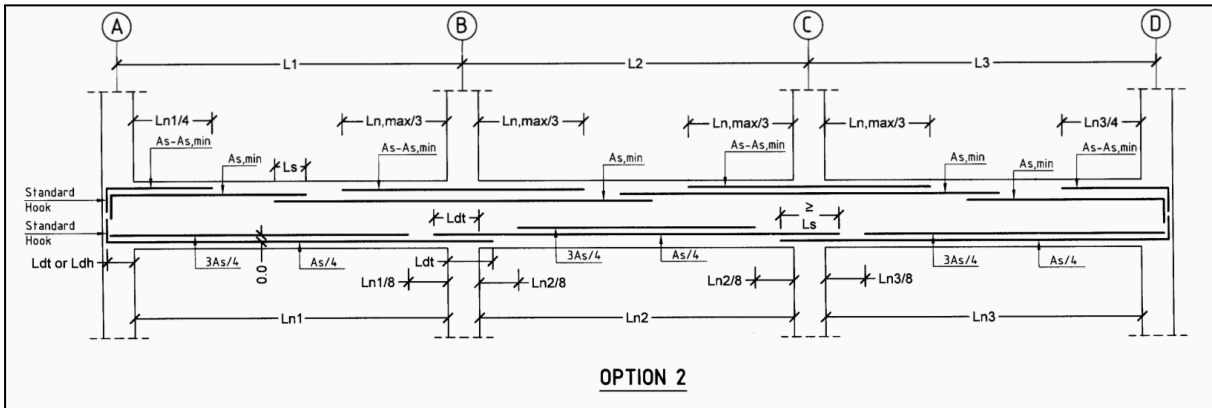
Schematic of ACI 318-19 beam detailing requirements, Option 2
